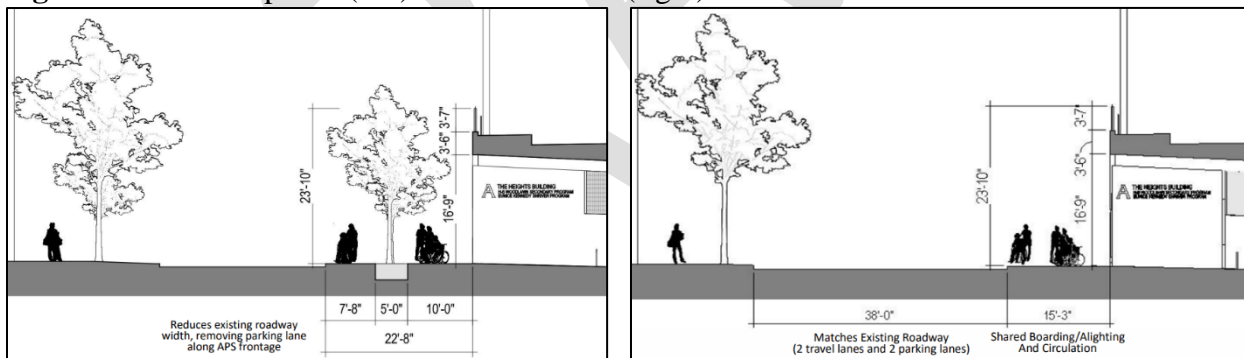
APS Proposed (left) and Alternative (right) 18th Street North Section
